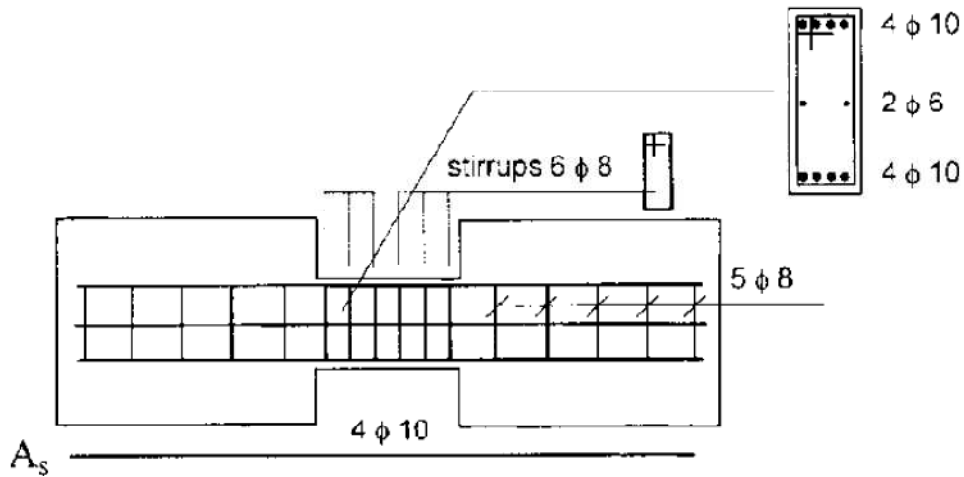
Section and Reinforcement Details of Specimen P02 (Galano and Vignoli 2000)
